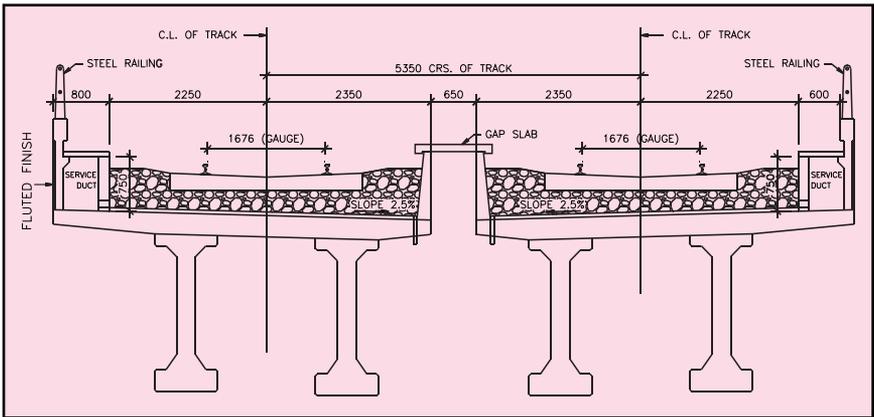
Typical Cross section of PSC T Beam girder spans 10m to 12m
